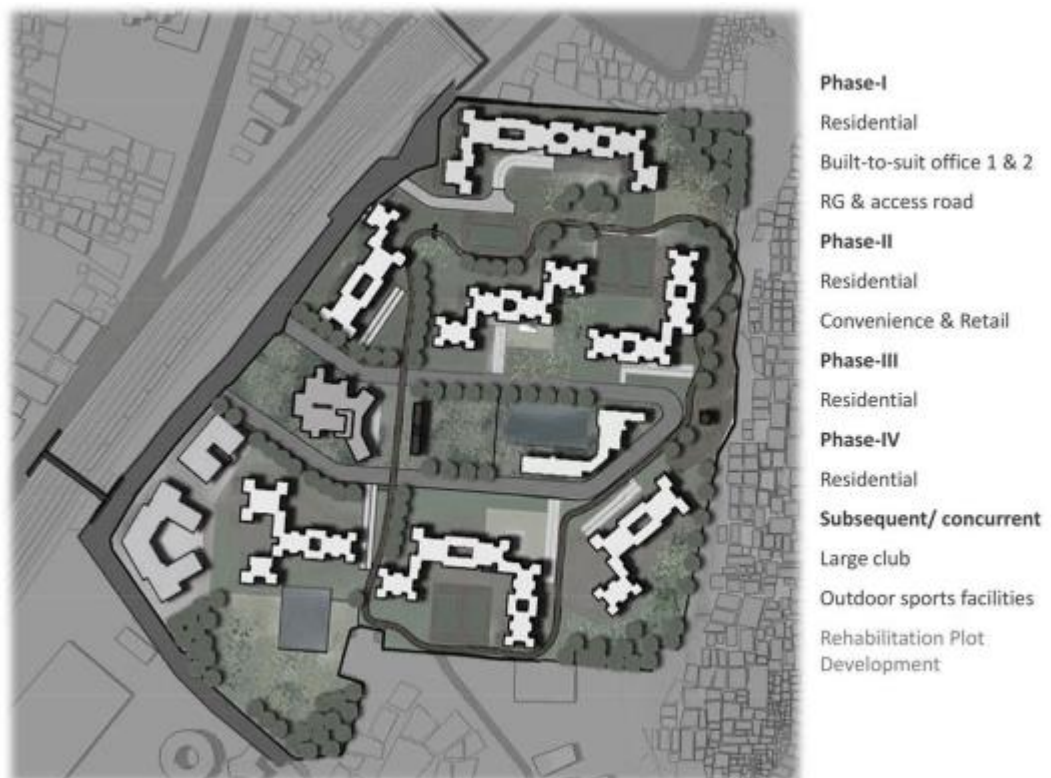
Presentation Image d: D1's design - site plan with buildings laid out
